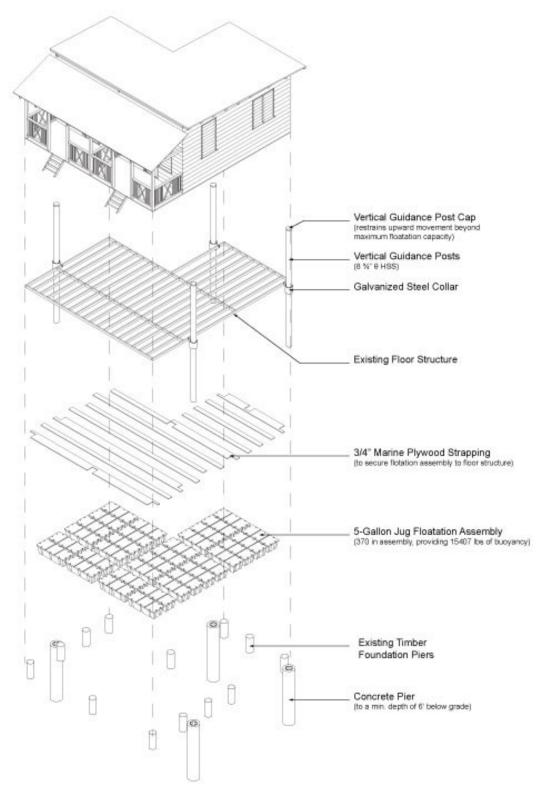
Buoyant foundation retrofit schematic-Port Maria house (drawing by: Scott Turner)
